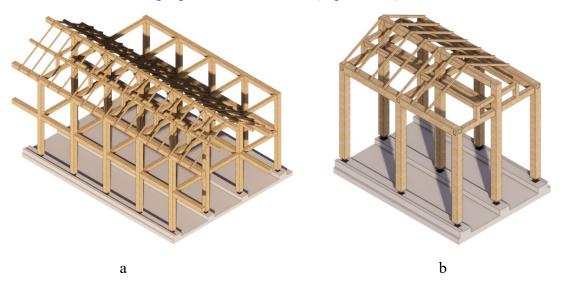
Two types of timber frame construction for the main spaces of the building (drawn by the author)
